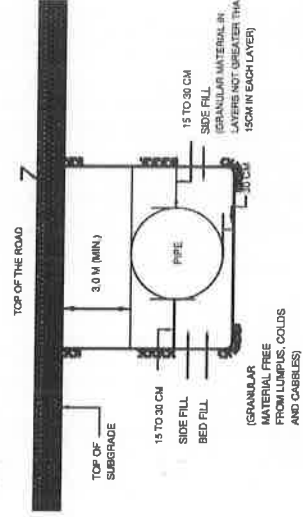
INSTALLATION OF PIPE FOR ALONG THE ROAD
